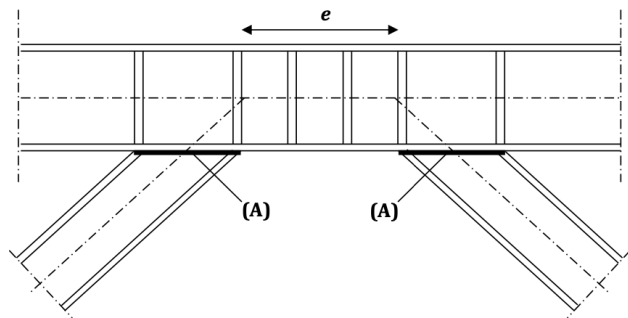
Welded brace connections of EBF: (A) full penetration groove welds in accordance with E.3.3.3(6)
